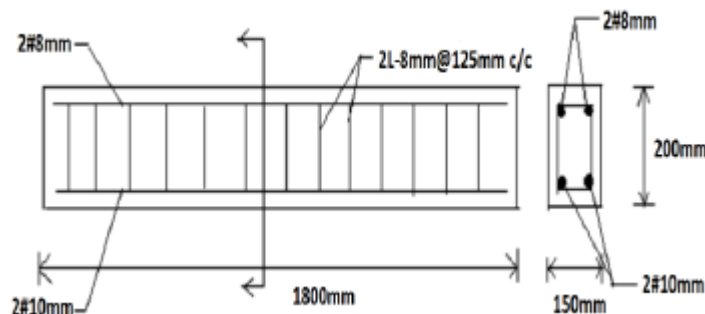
Simply supported beam detailing by Amith S. D. and H. B. Balakrishna
